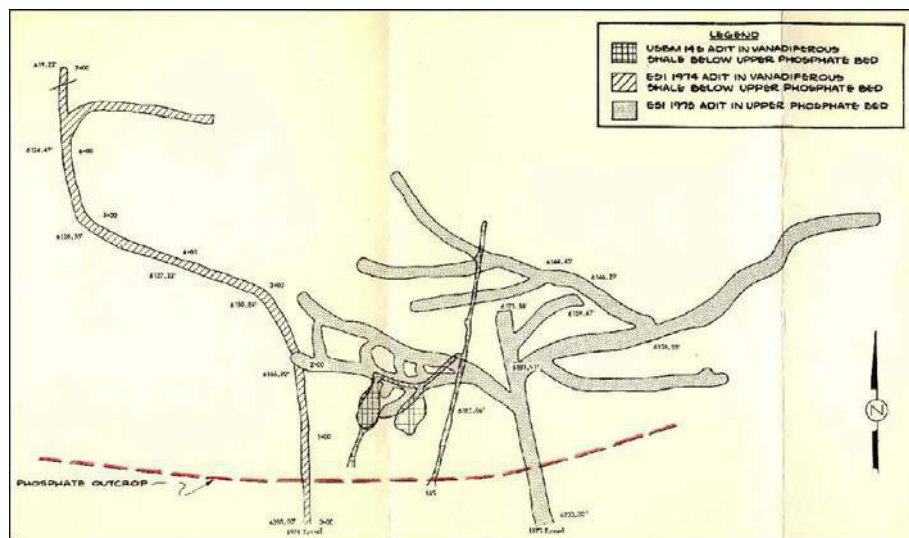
Plan View of 1974 Tunnel Drifted on the Vanadium Bed and 1975 Tunnel Drifted on the Phosphate Beds (after AMEC 2010) (Note: Map is historic and scale bar was not provided.)
